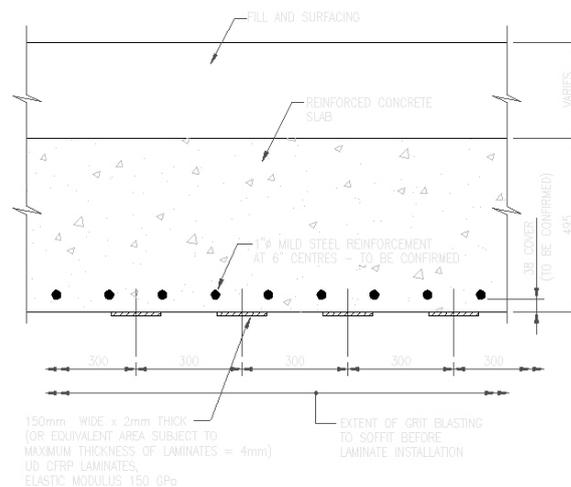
Section through concrete deck of the south span showing the internal and externally reinforcement
